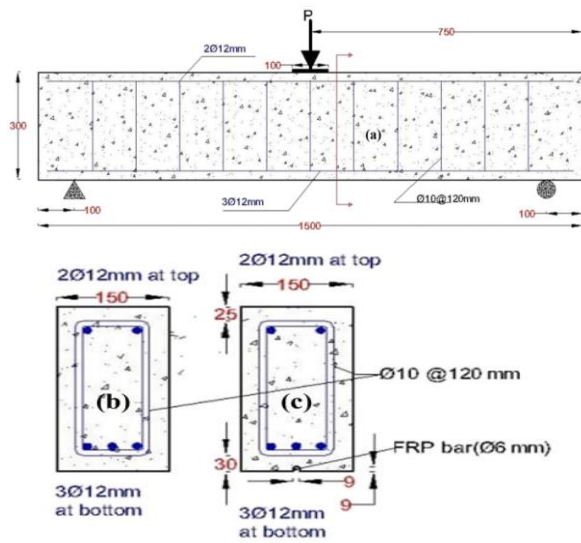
Testing arrangement, dimensions, and reinforcement details of the cross-sections of beam specimens strengthened with NSM reinforcing bars (NSM Bars) [12]
